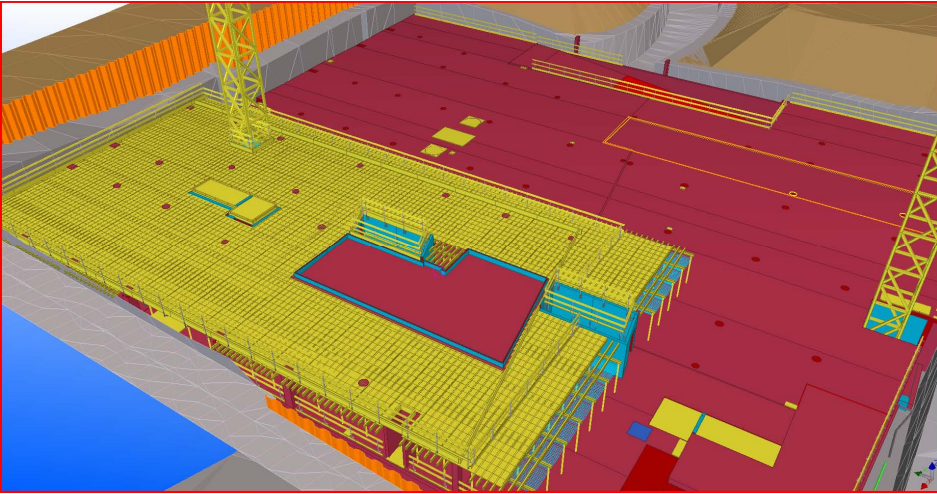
In the last phase of constructing the casting moulds, timber panels and edge beams of the floor mould system, and related safety guardrails have been installed.
